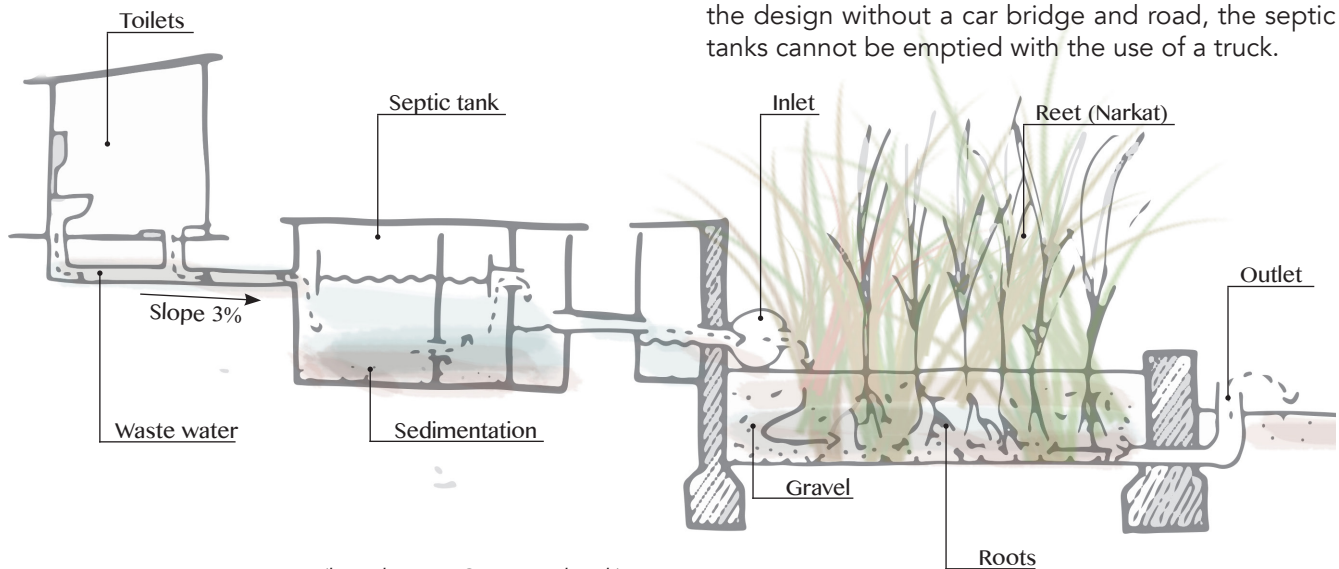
Waste water systems (based on P.W.Germeraad, n.d.)
